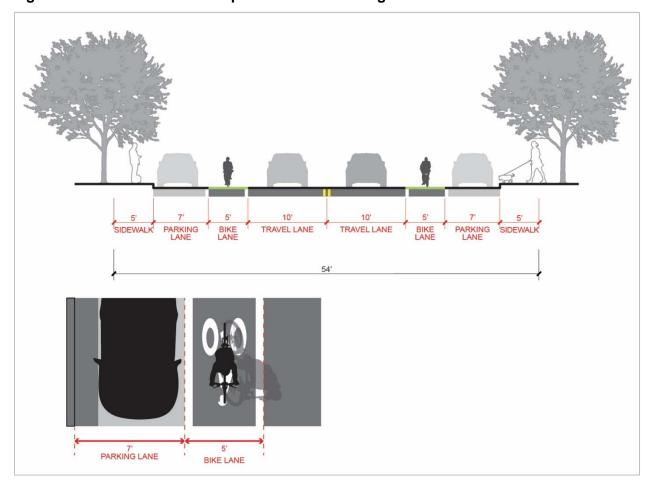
Garfield Street—Proposed Double Parking Lane Cross-Section
